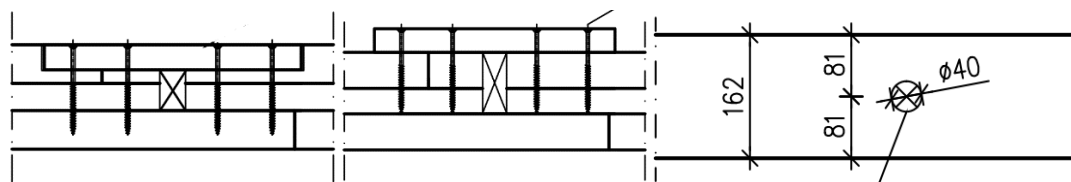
Installation hole options for SAS 670/800 22TR rod to be placed inside the LVL-X wall. Courtesy of A-Insinööri, Joensuu
